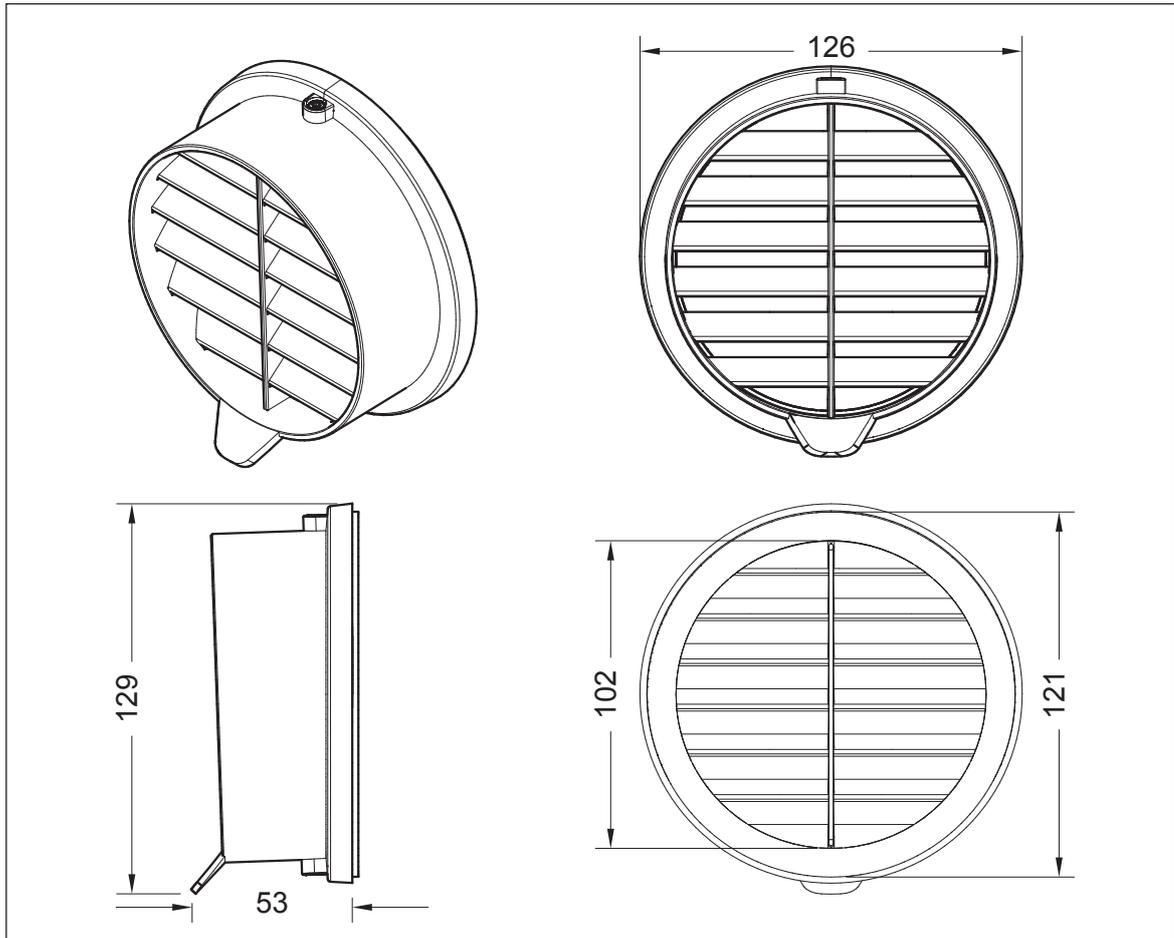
Dimensions of the outer wall terminal plastic pipe set M-WRG-II KSR (-1, -2), dimensions in millimetres
